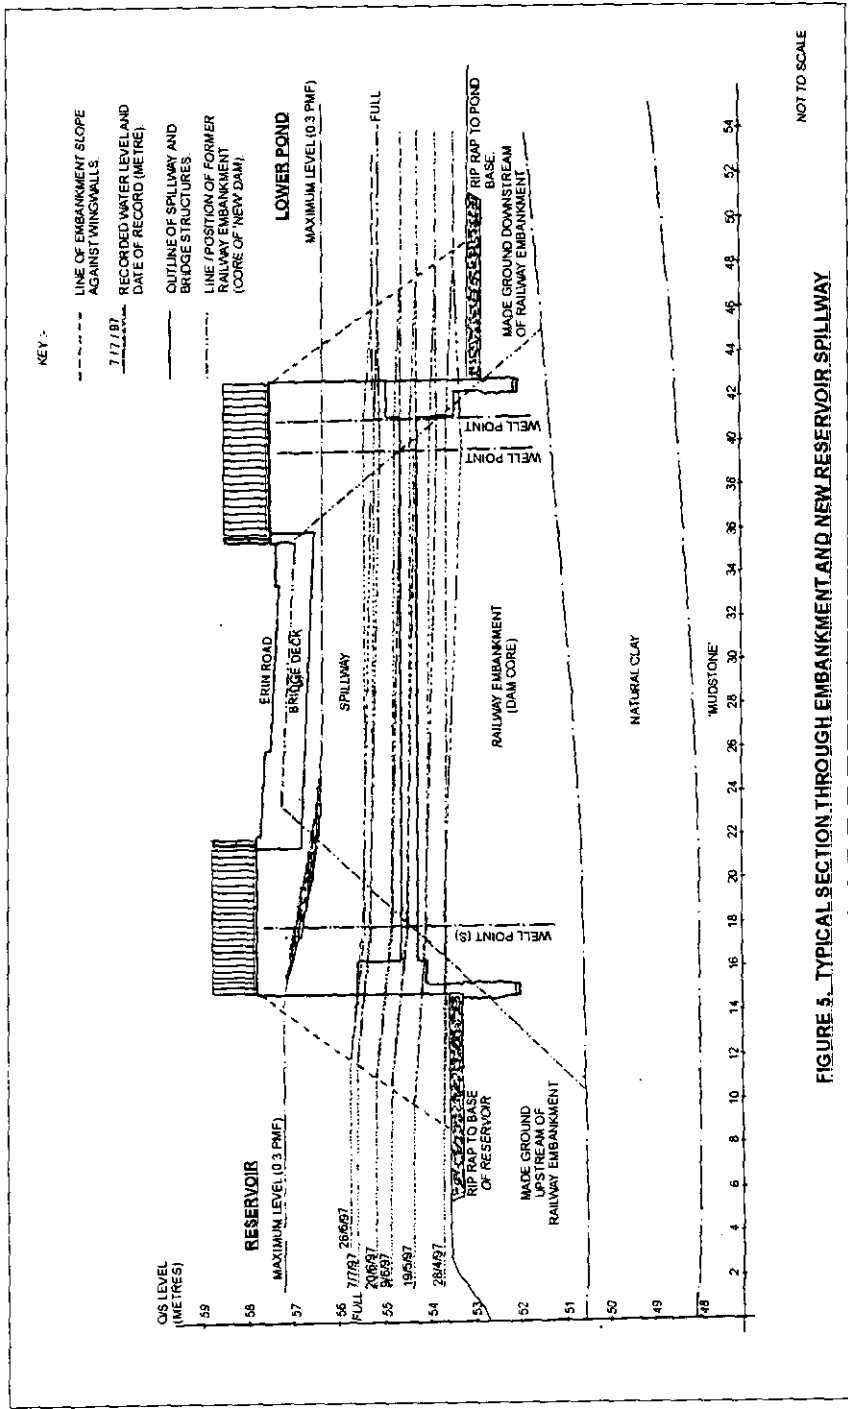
TYPICAL SECTION THROUGH EMBANKMENT AND NEW RESERVOIR SPILLWAY
